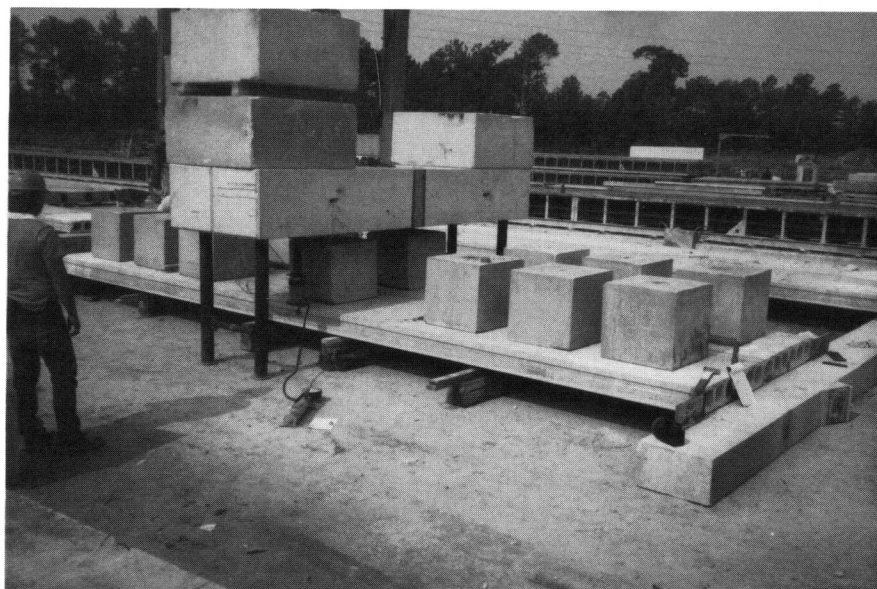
Test setup showing adjacent slabs, quasi-uniform loading and reaction beam over slabs.
